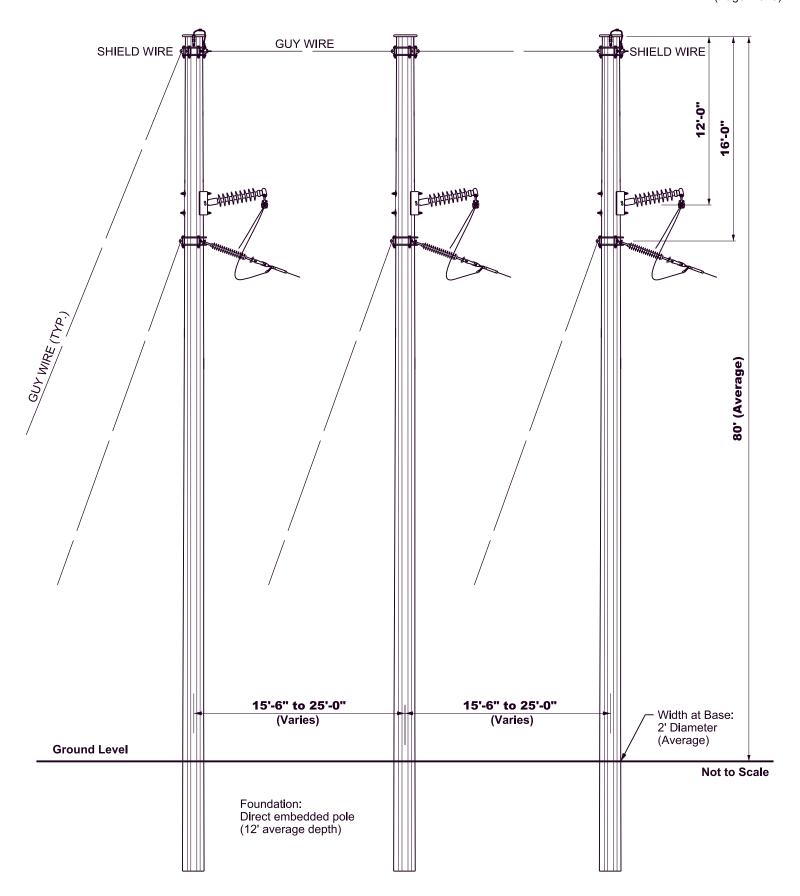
TYPICAL PROPOSED SINGLE CIRCUIT H-FRAME TRANSMISSION LINE STRUCTURE
